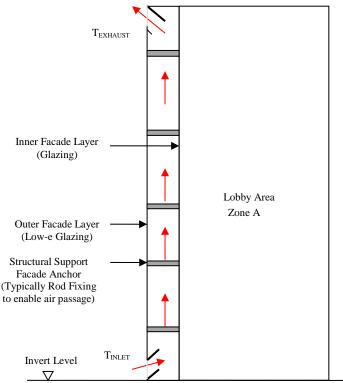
Ventilated Double Facade Block Diagram (Section View)
